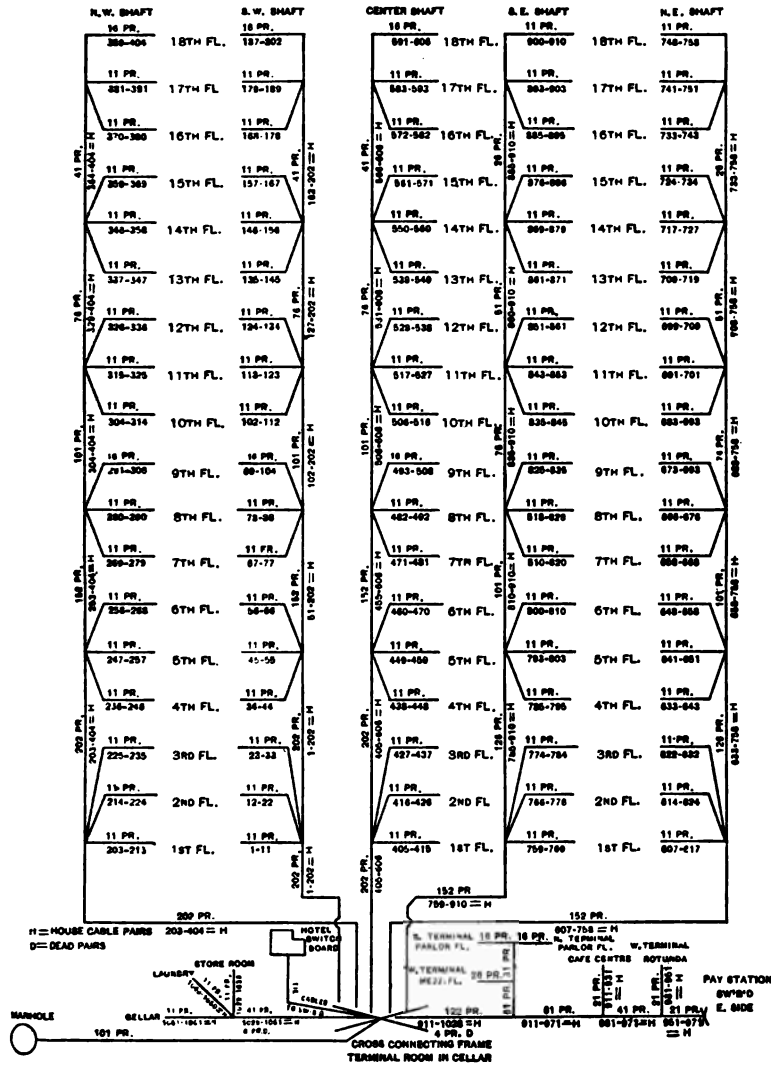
18-STORY HOTEL, HOUSE CABLE DISTRIBUTION.
